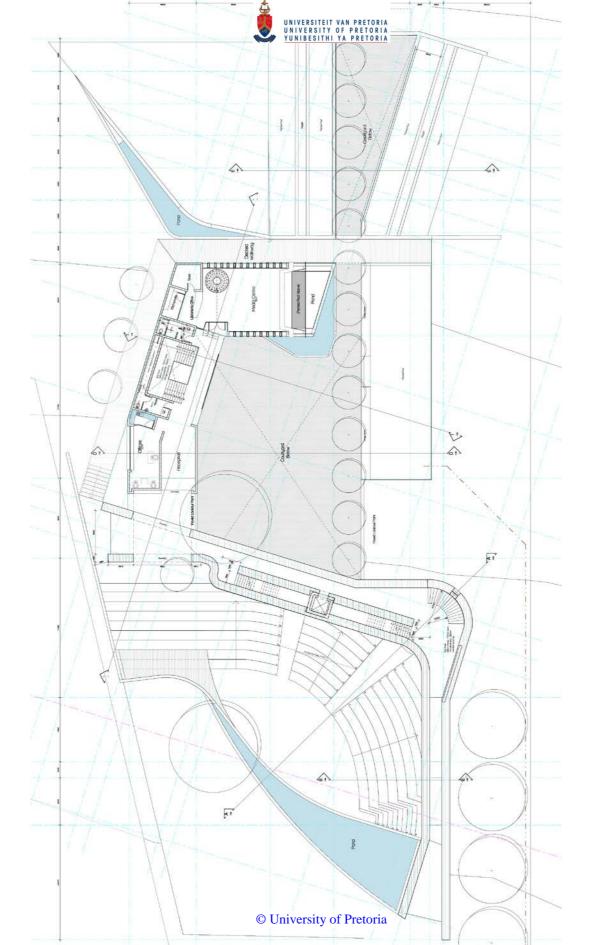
Development of the First Floor Plan (NTS), 22 September 2016
